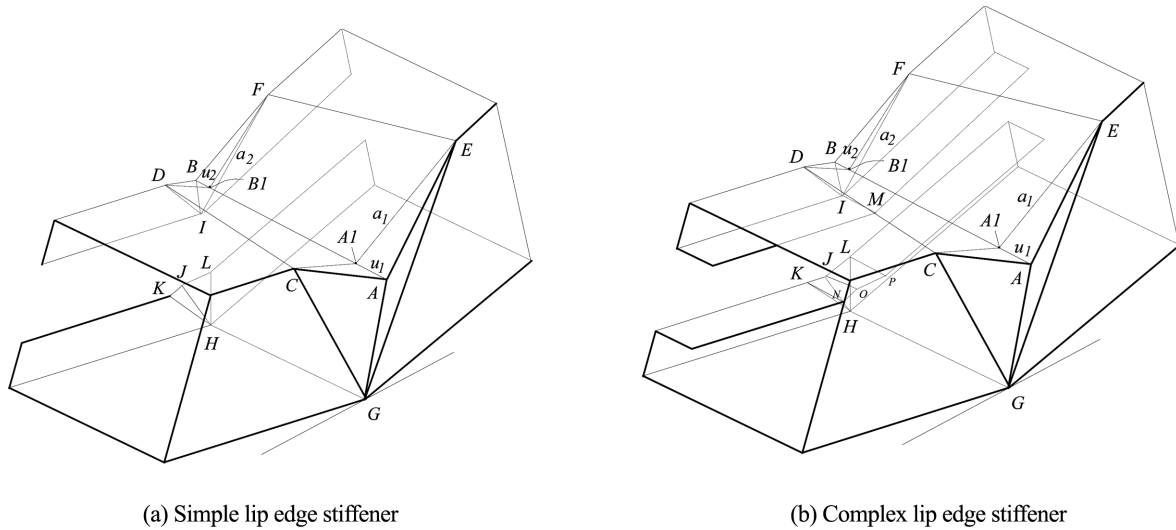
YLM model for cold-formed channel sections with flange edge stiffeners
